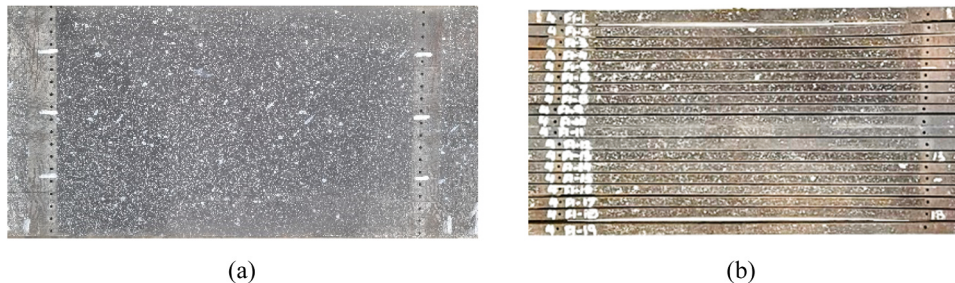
Steps of sectioning method: (a) gauge holes drilled in cross-section before initial measurements and (b) cross-section cut into strips by waterjetting before final measurements.
